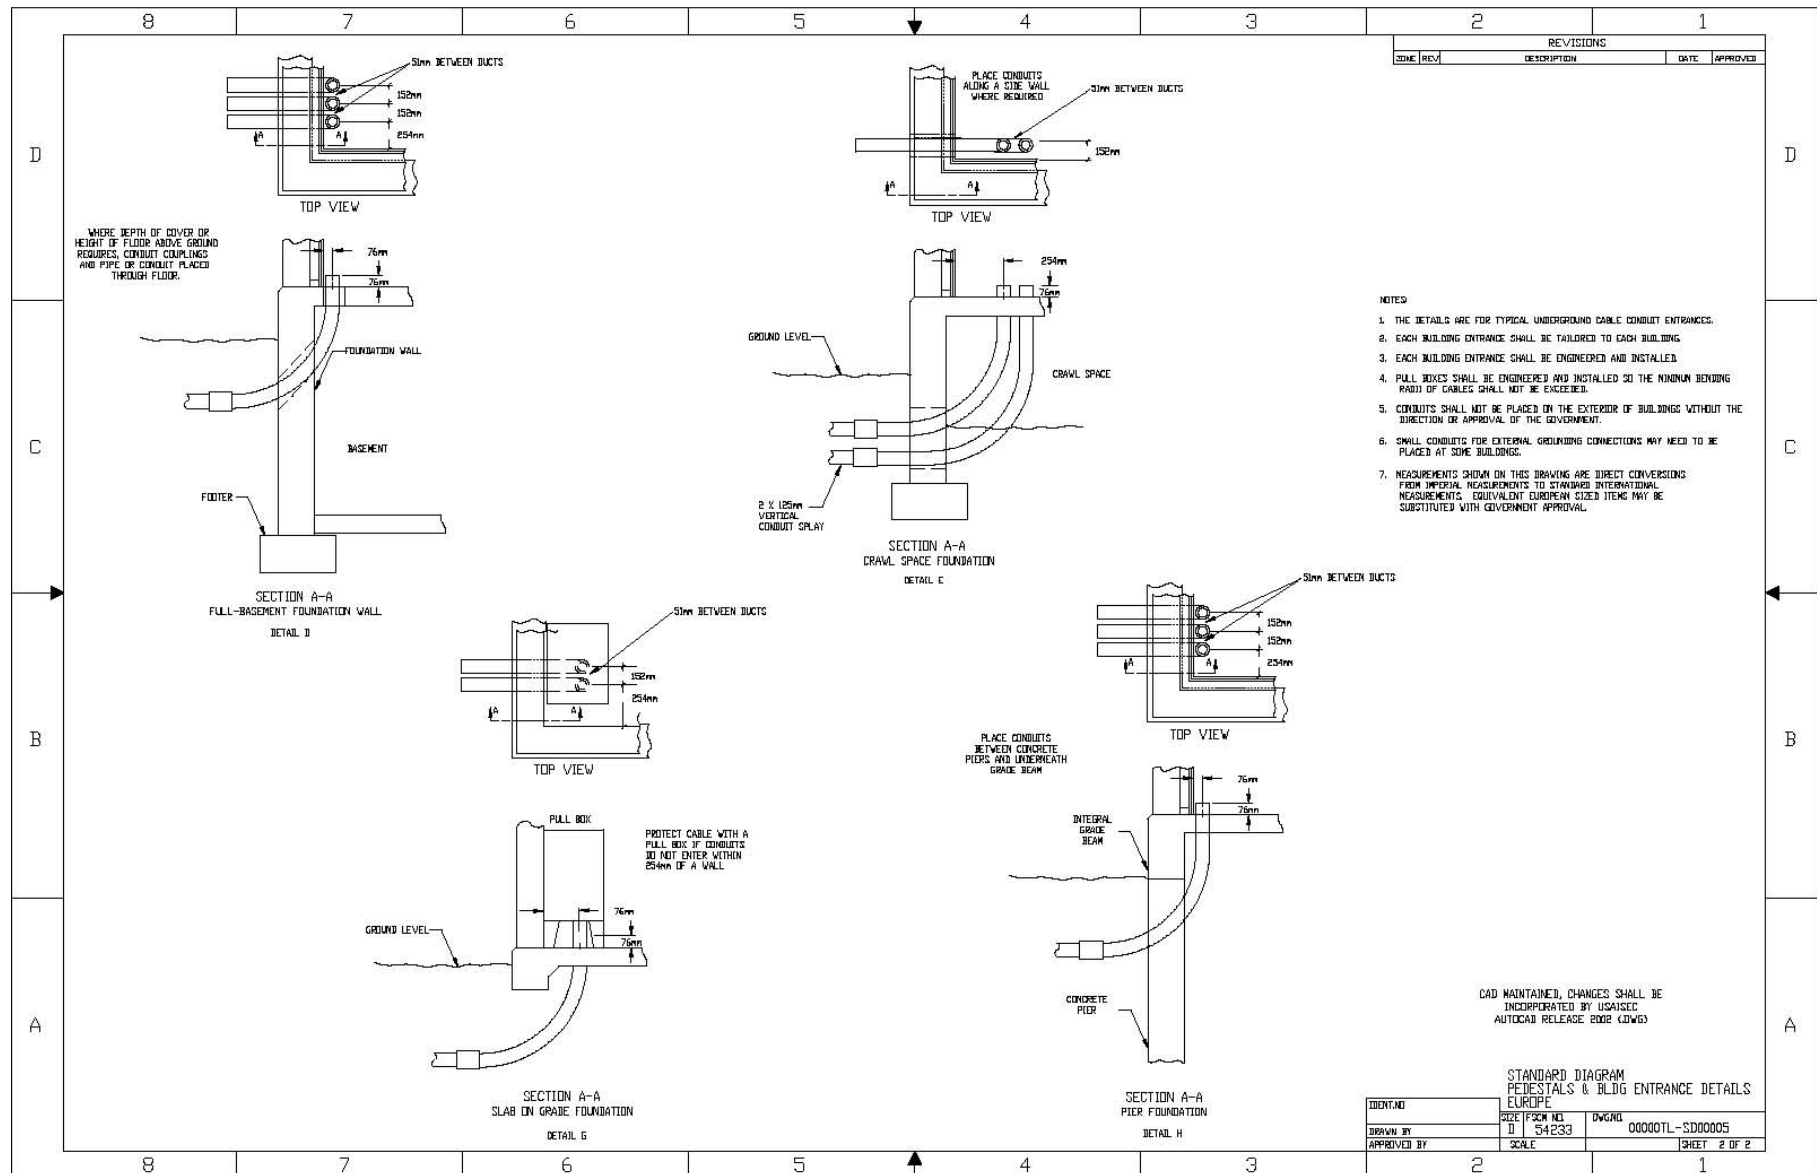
Pedestals and Building Entrance Details – Europe (2 of 2)
